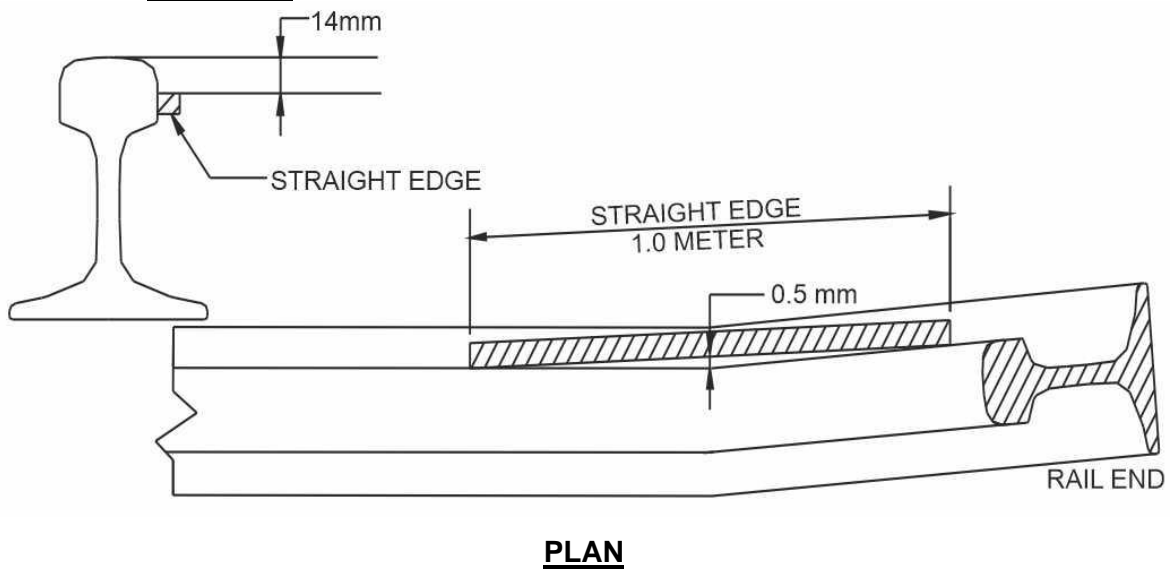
(c) Tolerance on the End Bends in the Horizontal Plane
